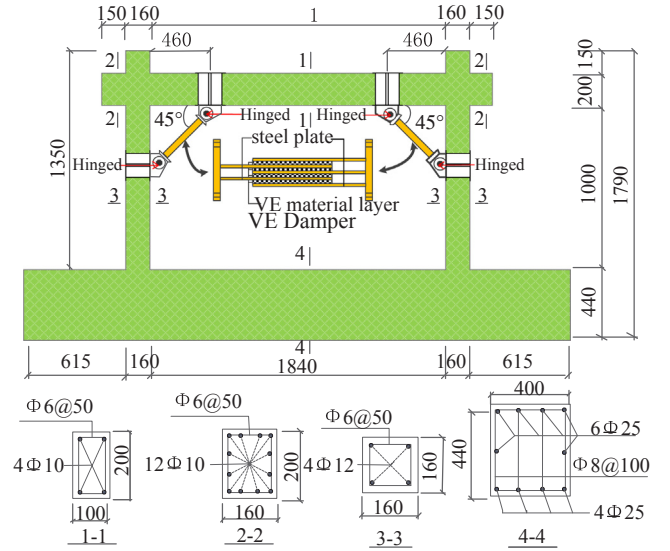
Geometries and reinforcement details for RC frames with haunch viscoelastic damping braces (all dimensions in mm).
